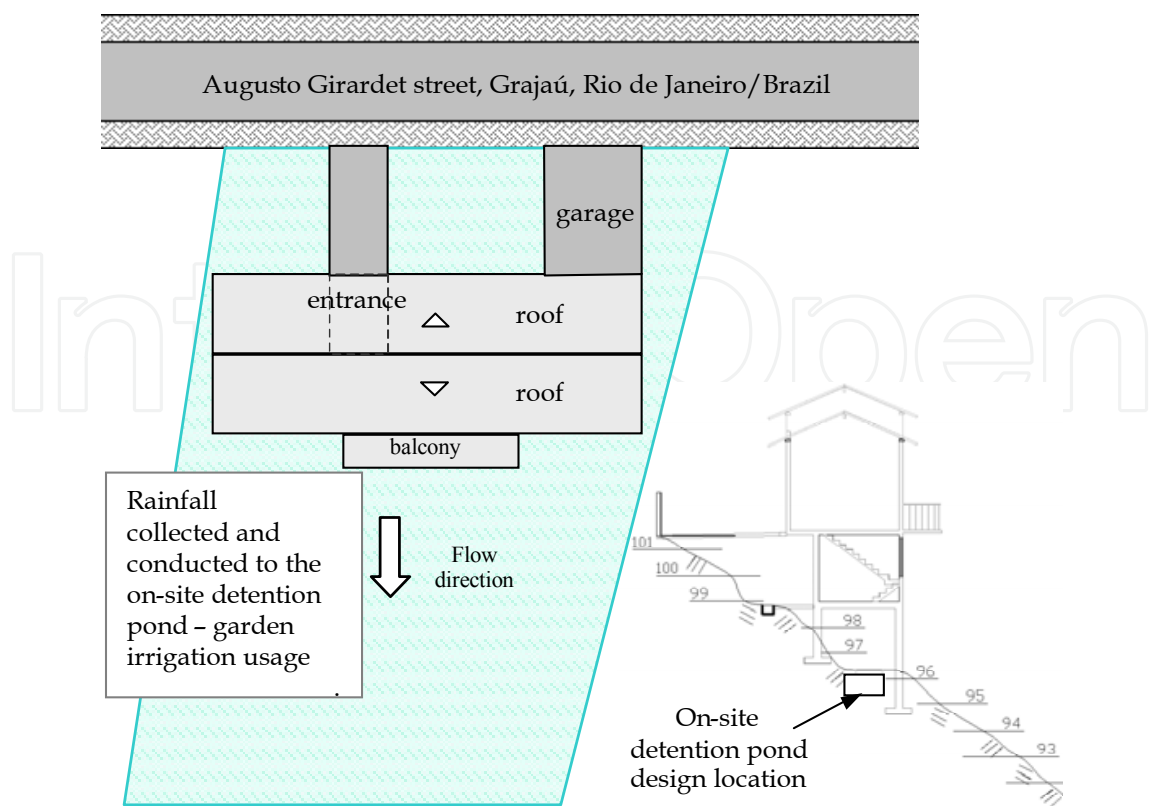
On-site detention pond, collecting rainfall from the house roof
